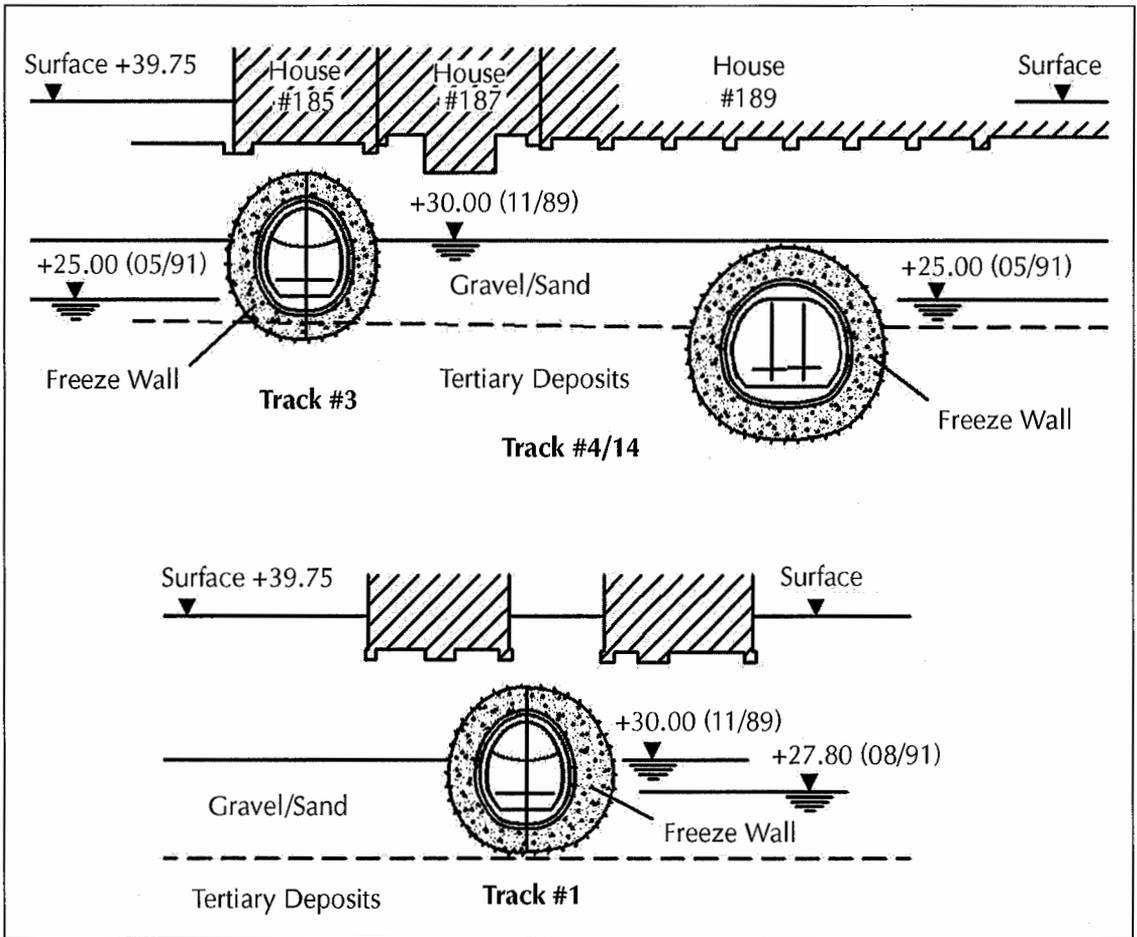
Cross-sections of the three track tunnels on the Düsseldorf subway project where brine ground freezing methods were applied.
